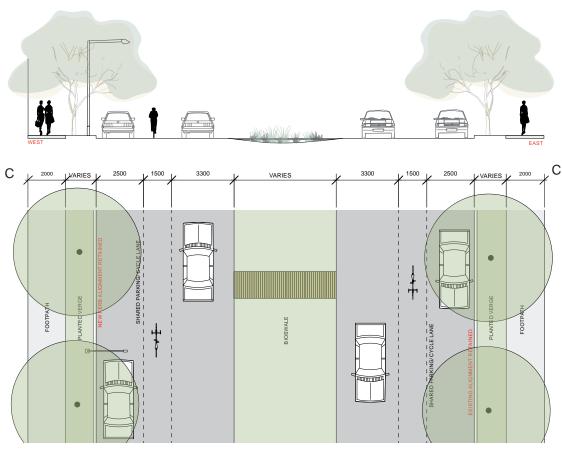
TYPICAL STREET SECTION THROUGH WATKINS STREET
